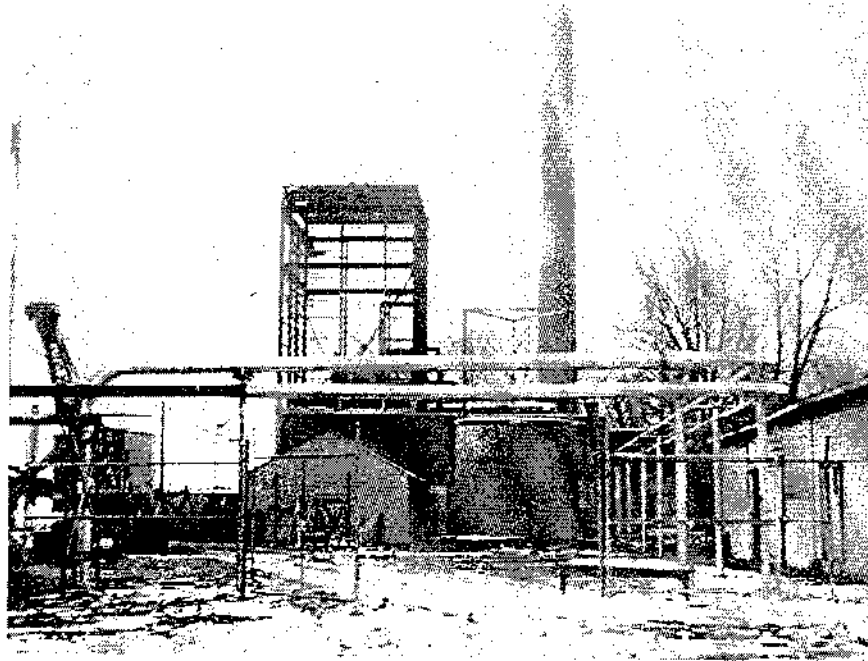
Retort building and gas piping, Grand Forks, December 1944.
